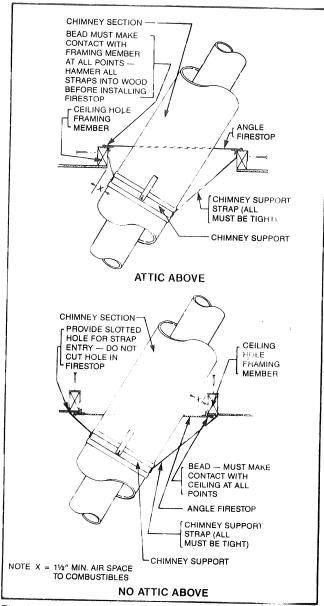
Mount chimney supports at ceiling hole frames or other structural framing.
